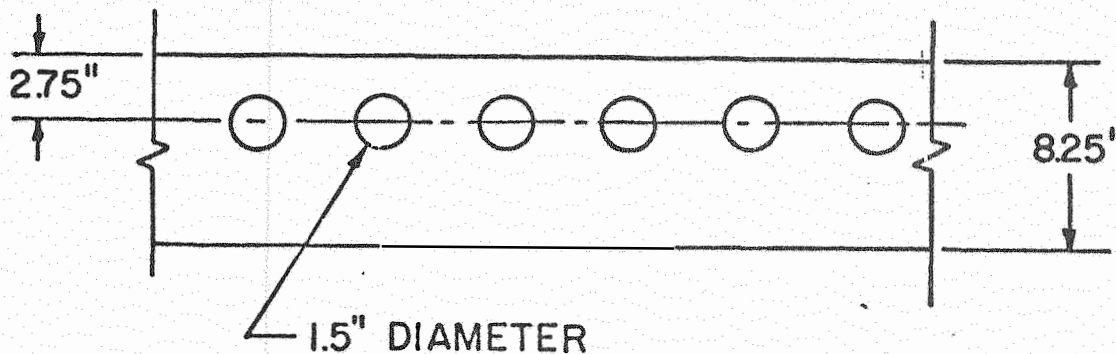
Vertical cross section through bridge with heat pipe installation. Section is perpendicular to traffic flow.
